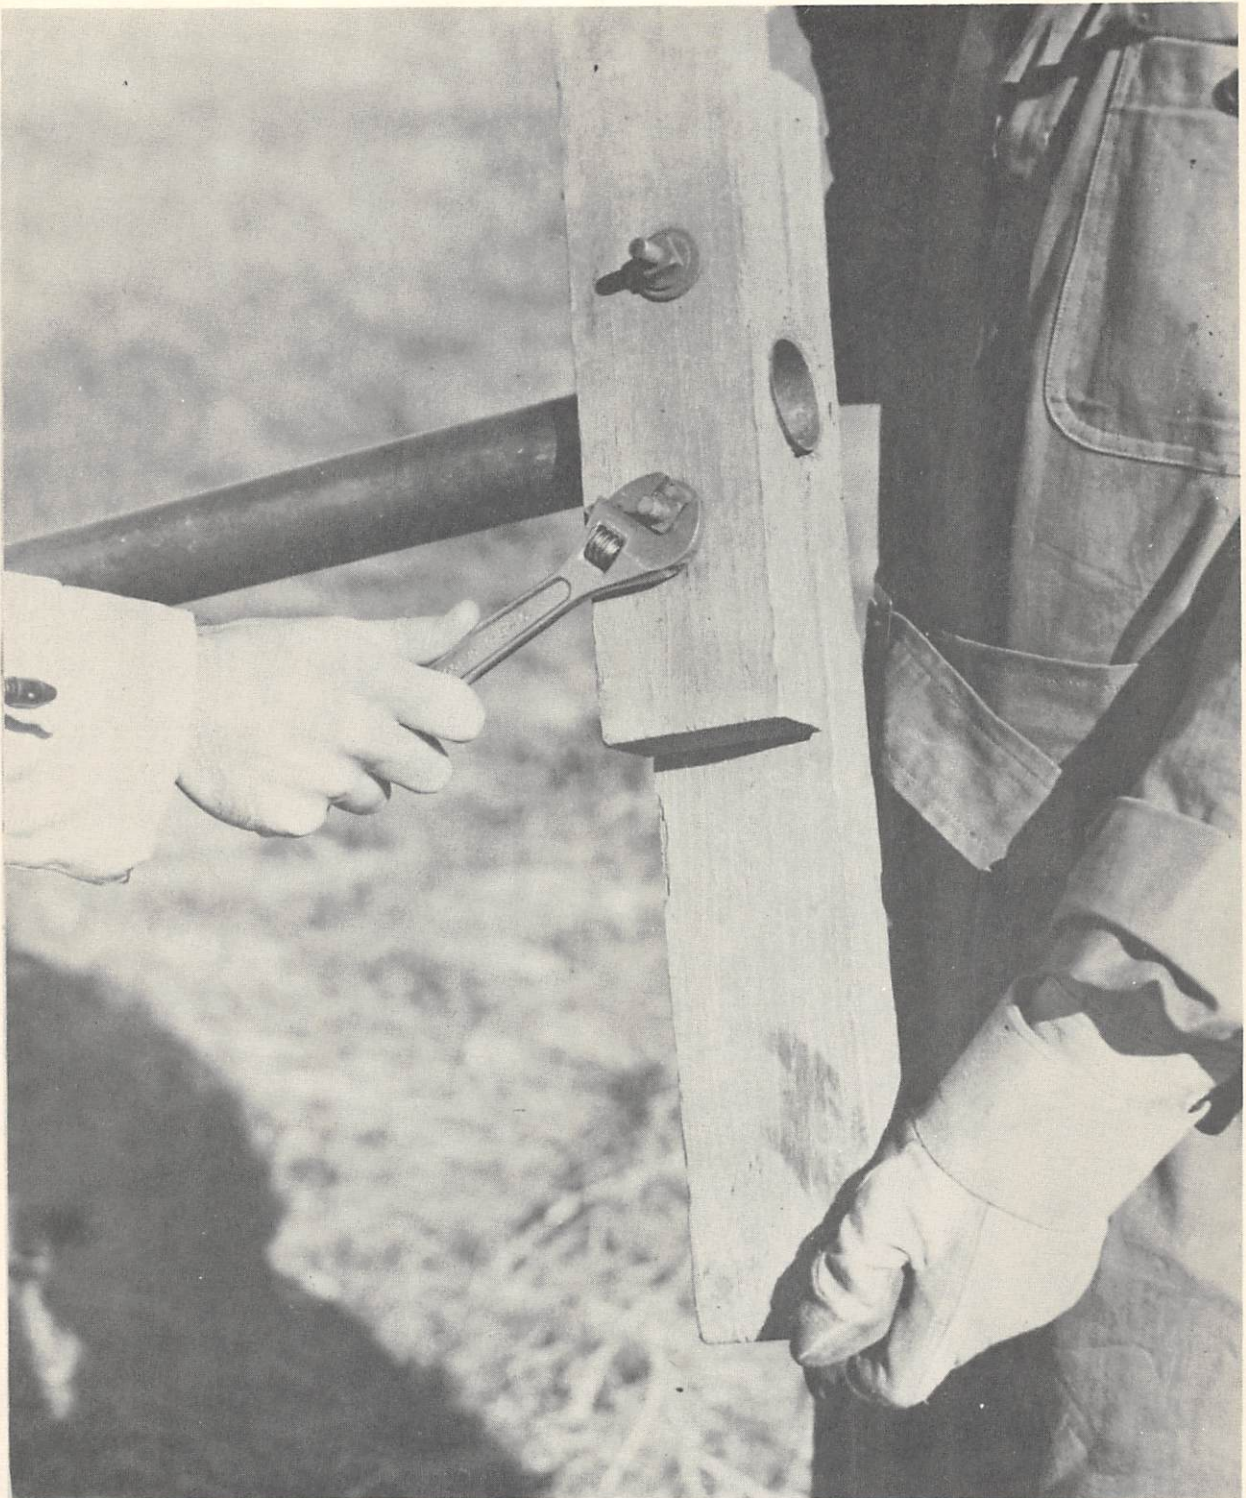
An oak puller used to push steel casing into the ground and to remove same after drilling.
